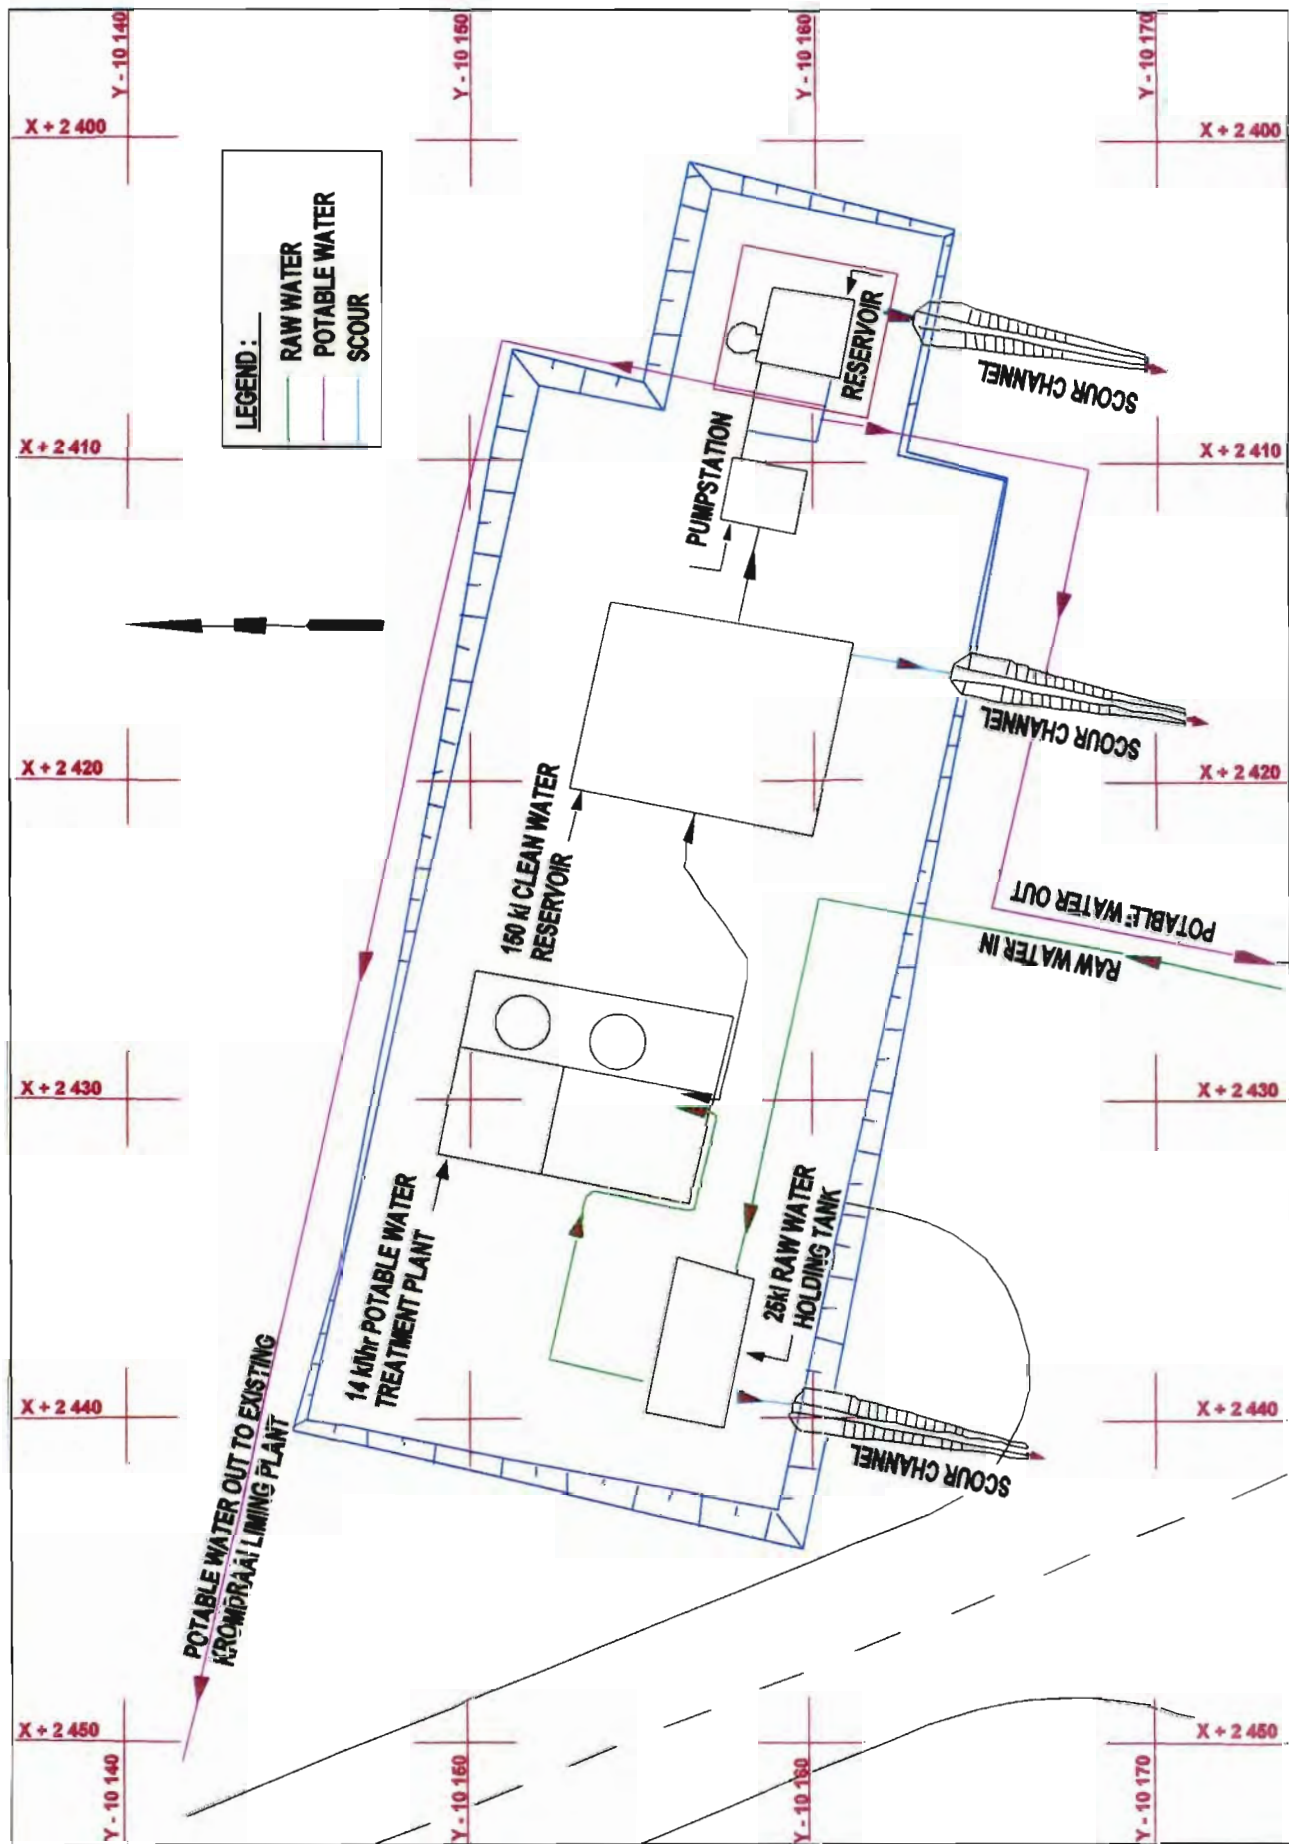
LAYOUT OF KROMDRAAI WATER TREATMENT PLANT
